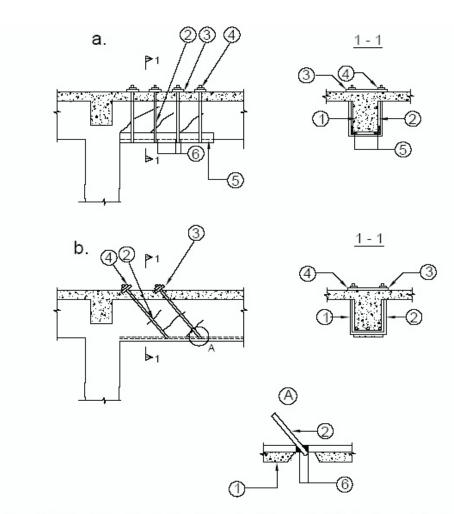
Repairing Gravity Load Capacity of Beams (1. Existing beam 2. Steel clamp; 3. Steel plate; 4. Nut; 5. Angle profile; 6. Welding)
